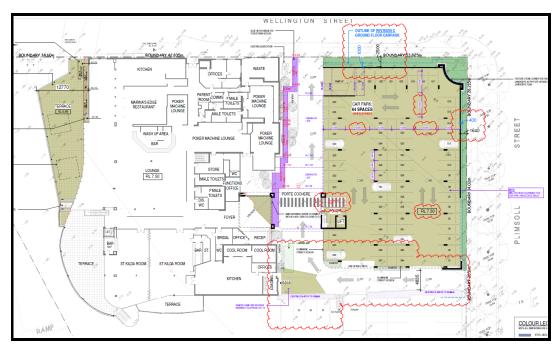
Amended Ground Floor Plan (Source: Innovate, Revision F)
